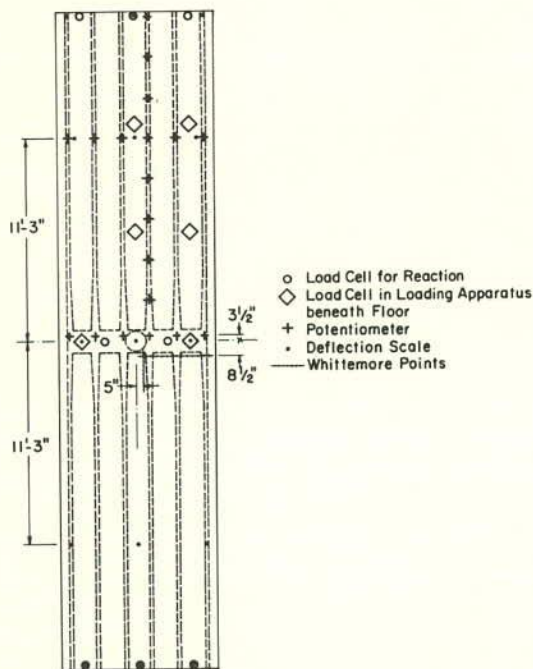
Instrumentation Layout for Single-Column Model Bridge
